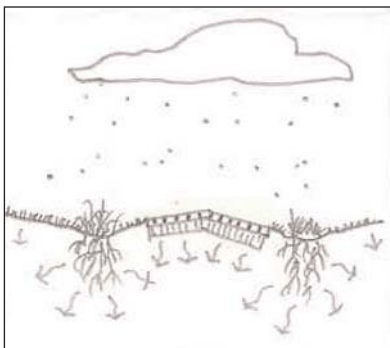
Depiction shows cross section of residential street converted with: permeable paving, and deep and fibrous rooted vegetation in shallow swales.
